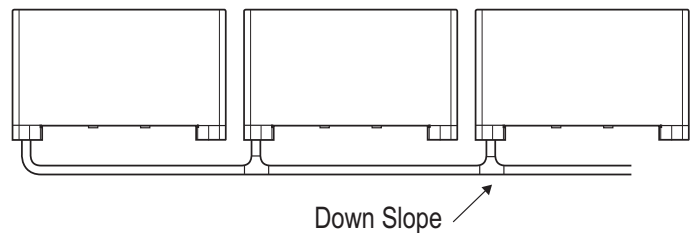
Ceiling Suspended and Convertible Surface (Ceiling Mounted Installation) Indoor Unit with Gravity Drain and Down Slope.
